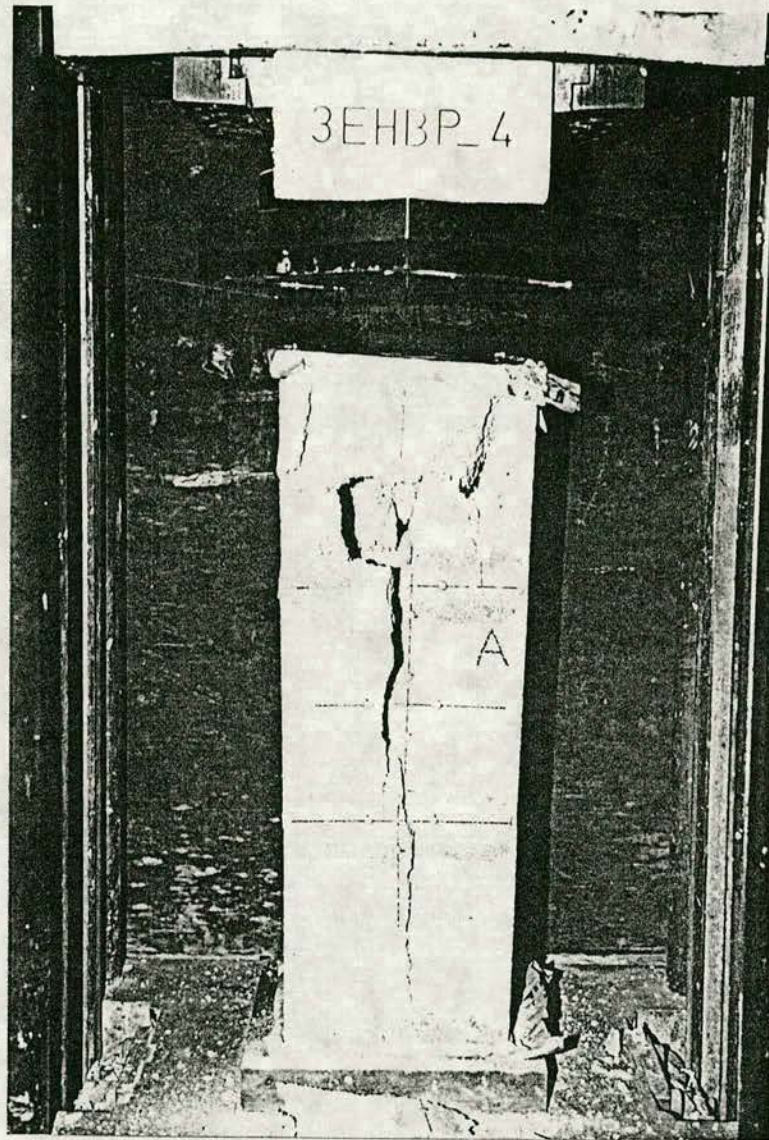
Unfilled 3HBP-MJ prism after failure,
